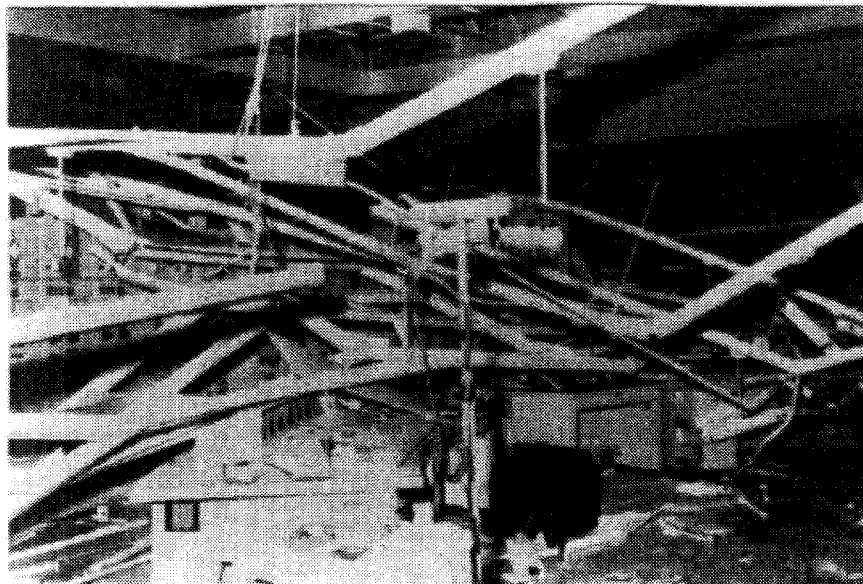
Control room ceiling failure in the 1971 San Fernando earthquake.
